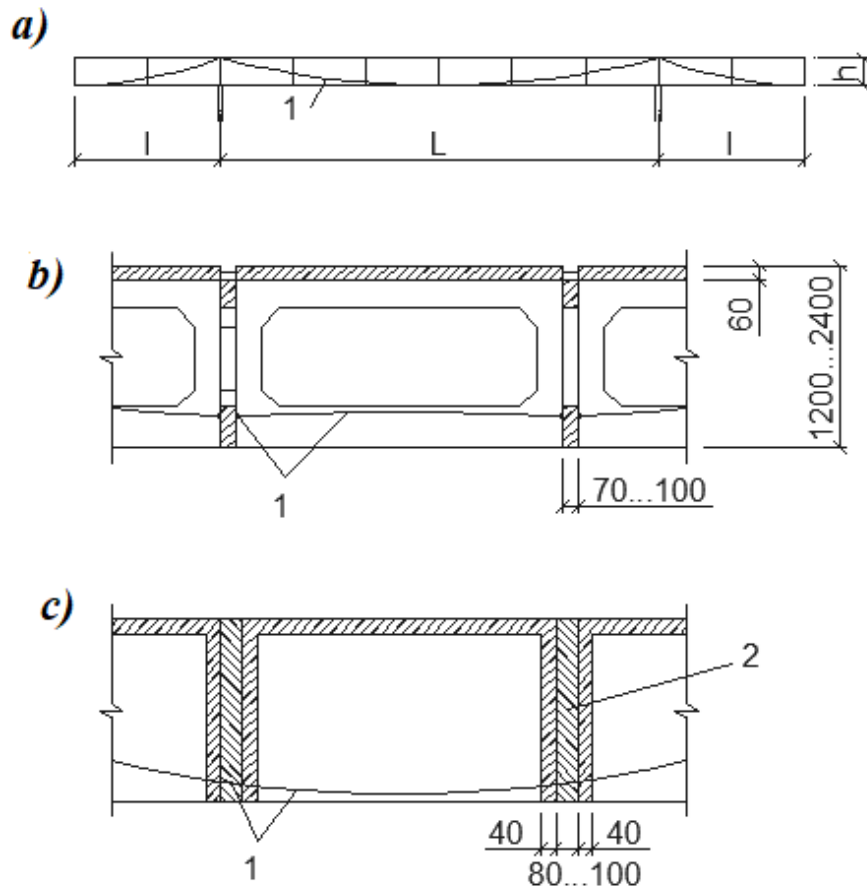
Cross-ribbed reinforced concrete construction:
